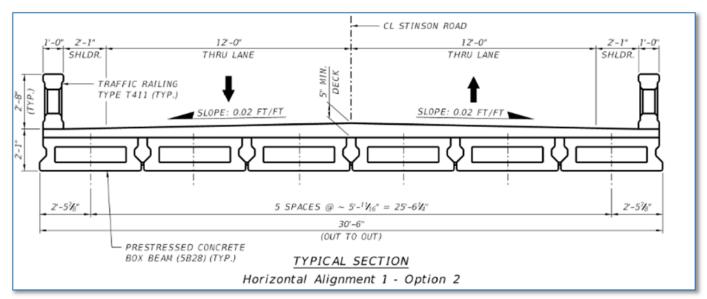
TxDOT Prestressed Concrete Box Beams (5B20) Typical Section
